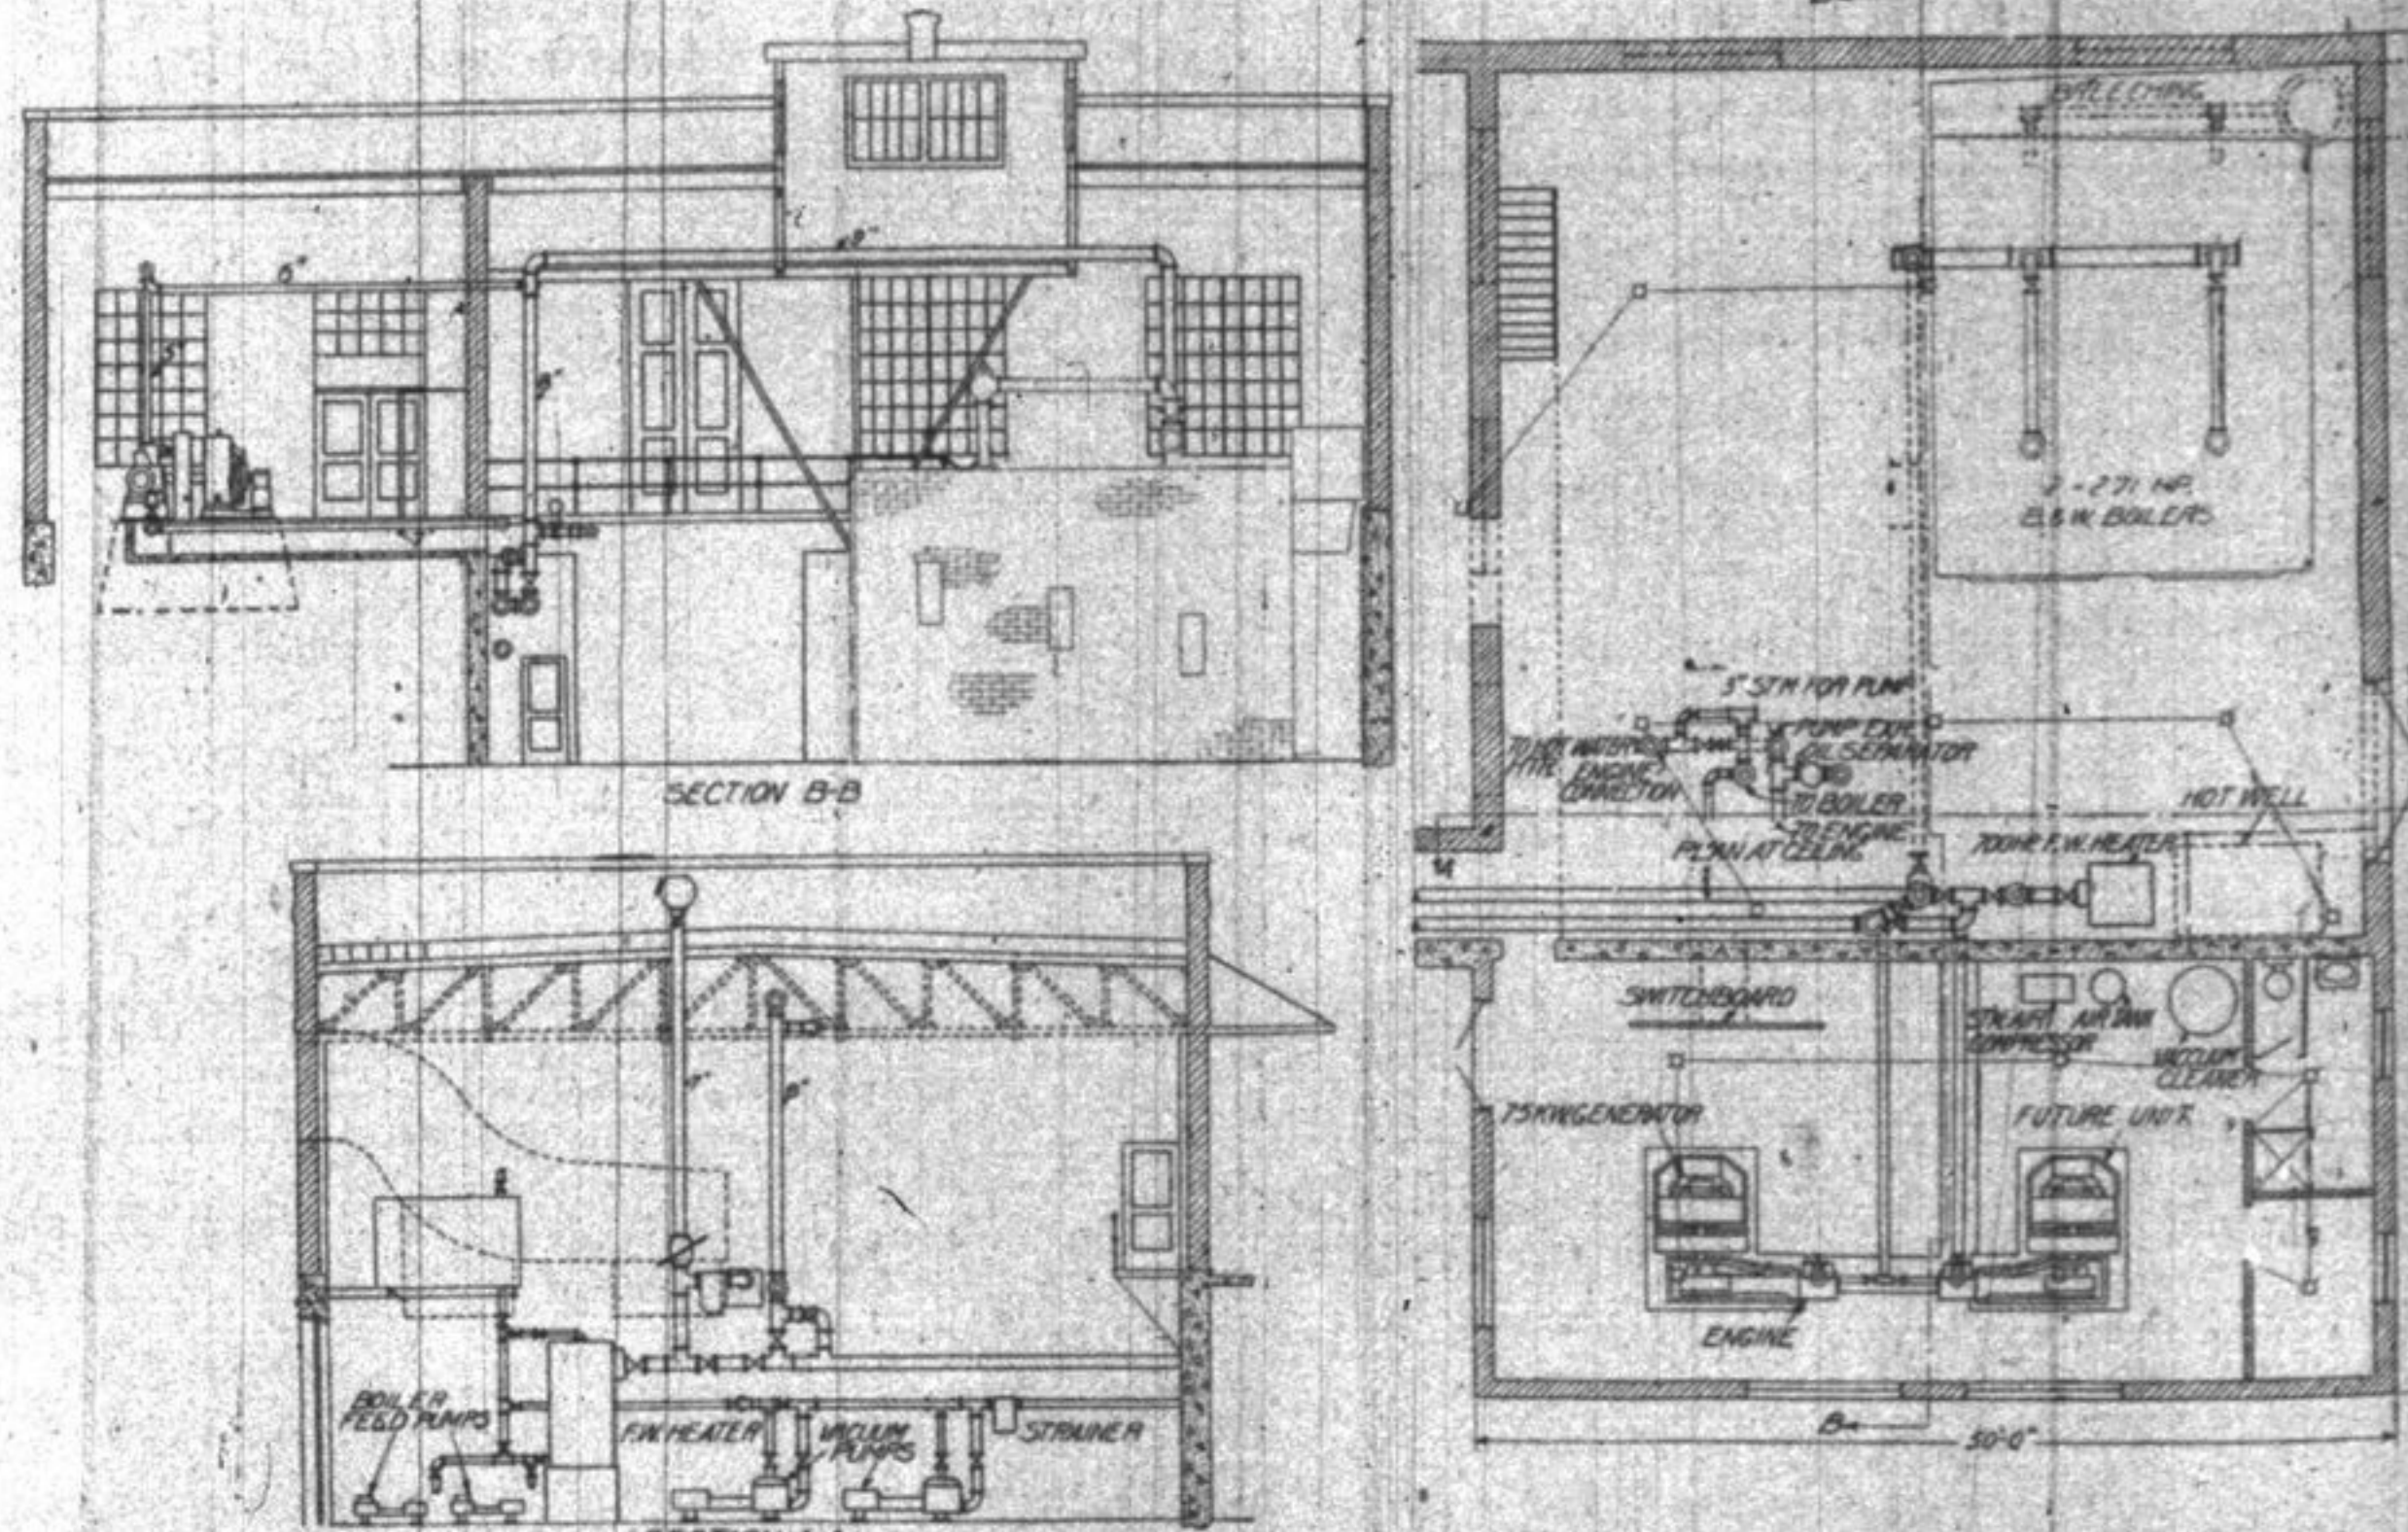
PLAN AND ELEVATION OF POWER HOUSE
